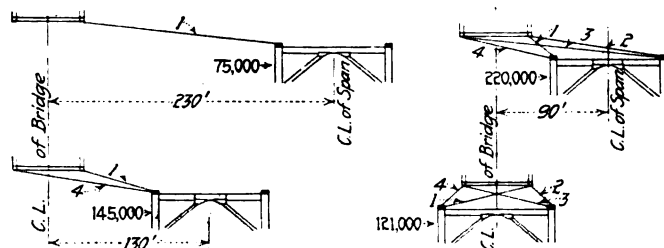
LINES FROM CENTER SPAN TO MOORING TRUSSES
